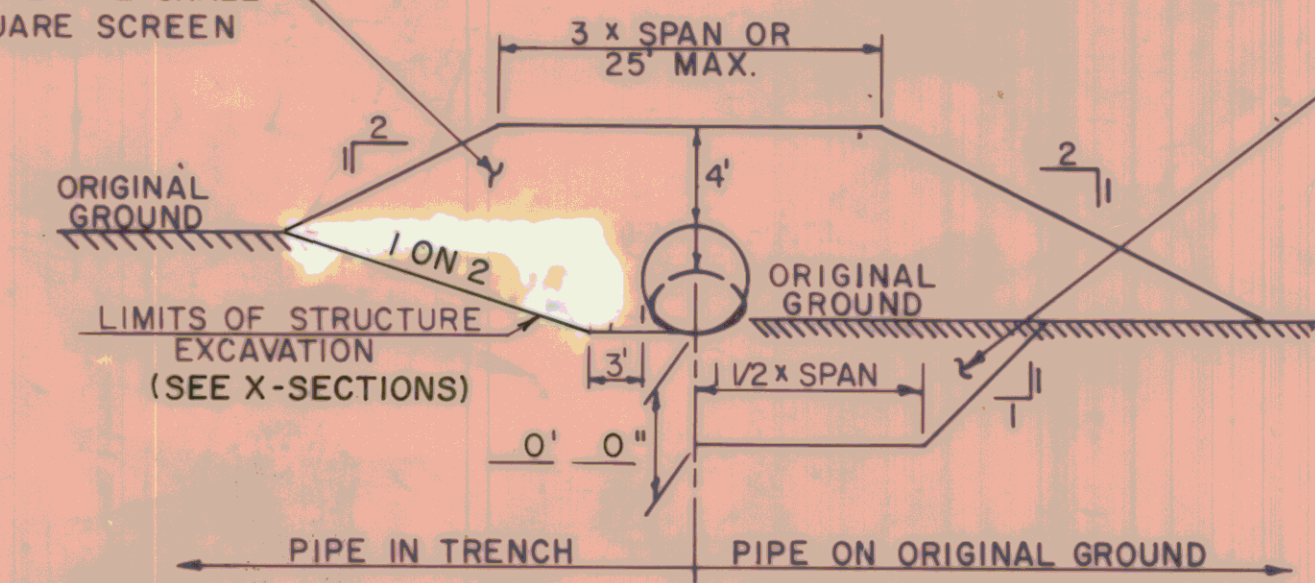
DETAILS OF STRUCTURAL PLATE PIPE CULVERTS
